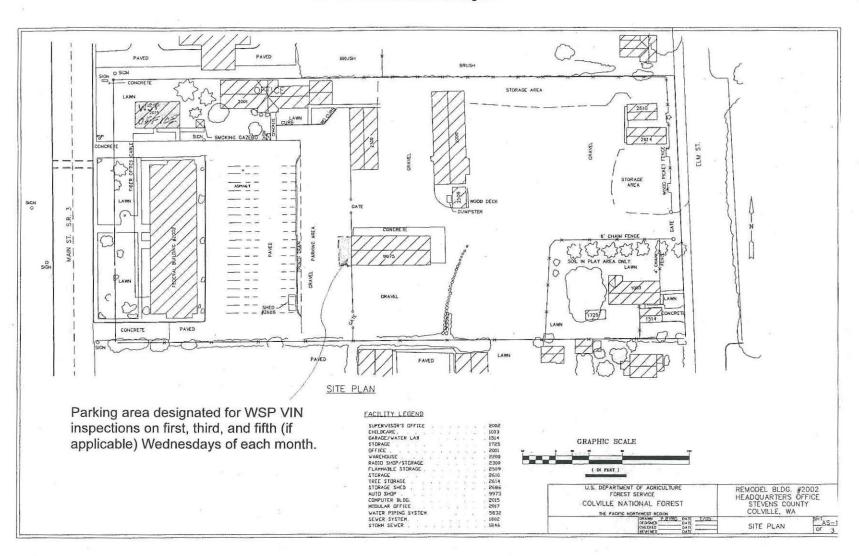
Exhibit B – Site Plan Washington State Patrol Use of Forest Service Building #2015
